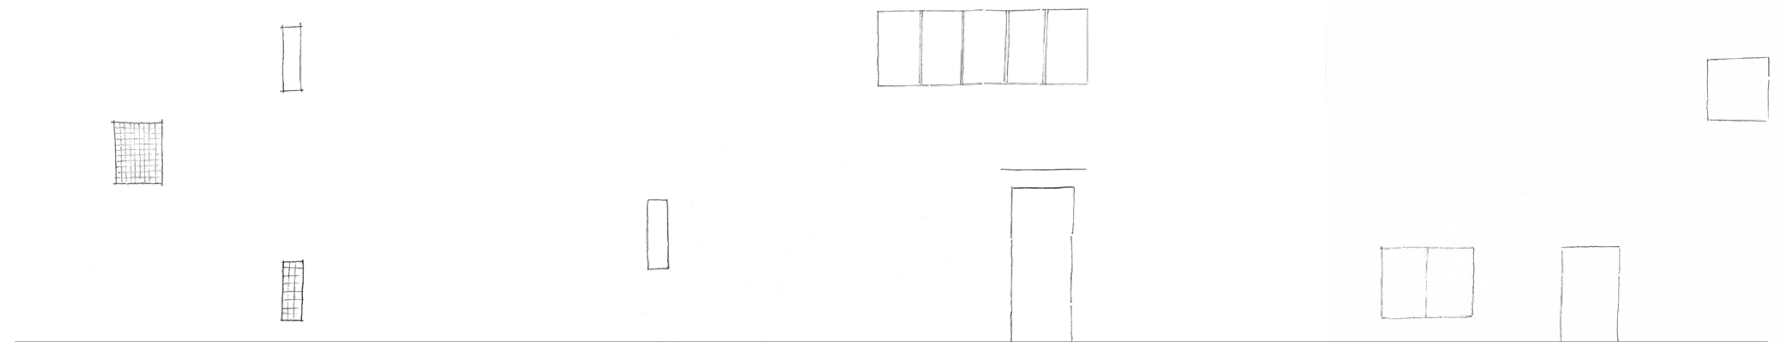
Side façades of Brödragatan 18-26, 28-36 & 38-46
